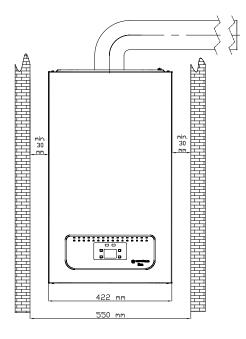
Boiler minimum dimensions in the cabinet \*Minimum clearances required for servicing
